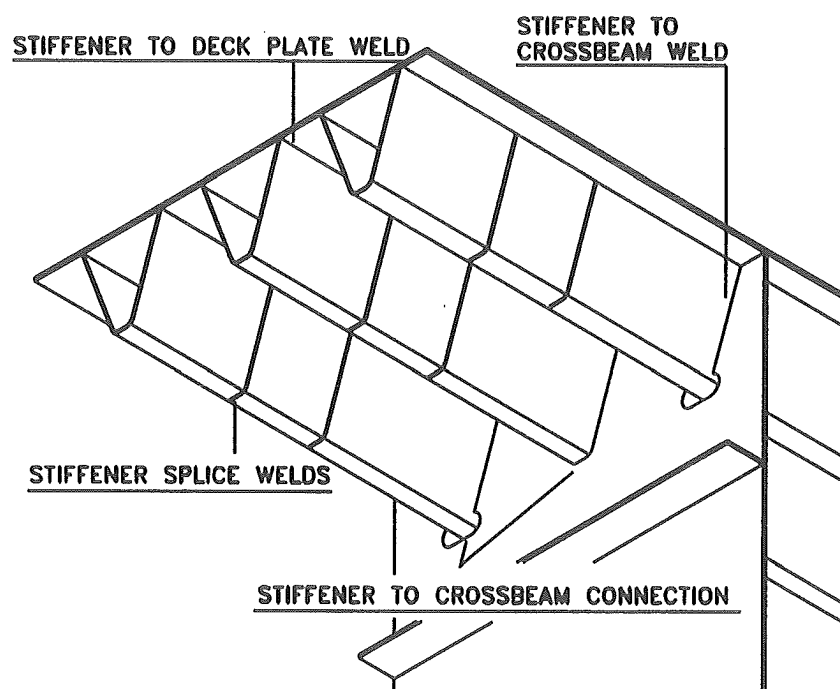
Main welded connections in a typical orthotropic bridge deck.
